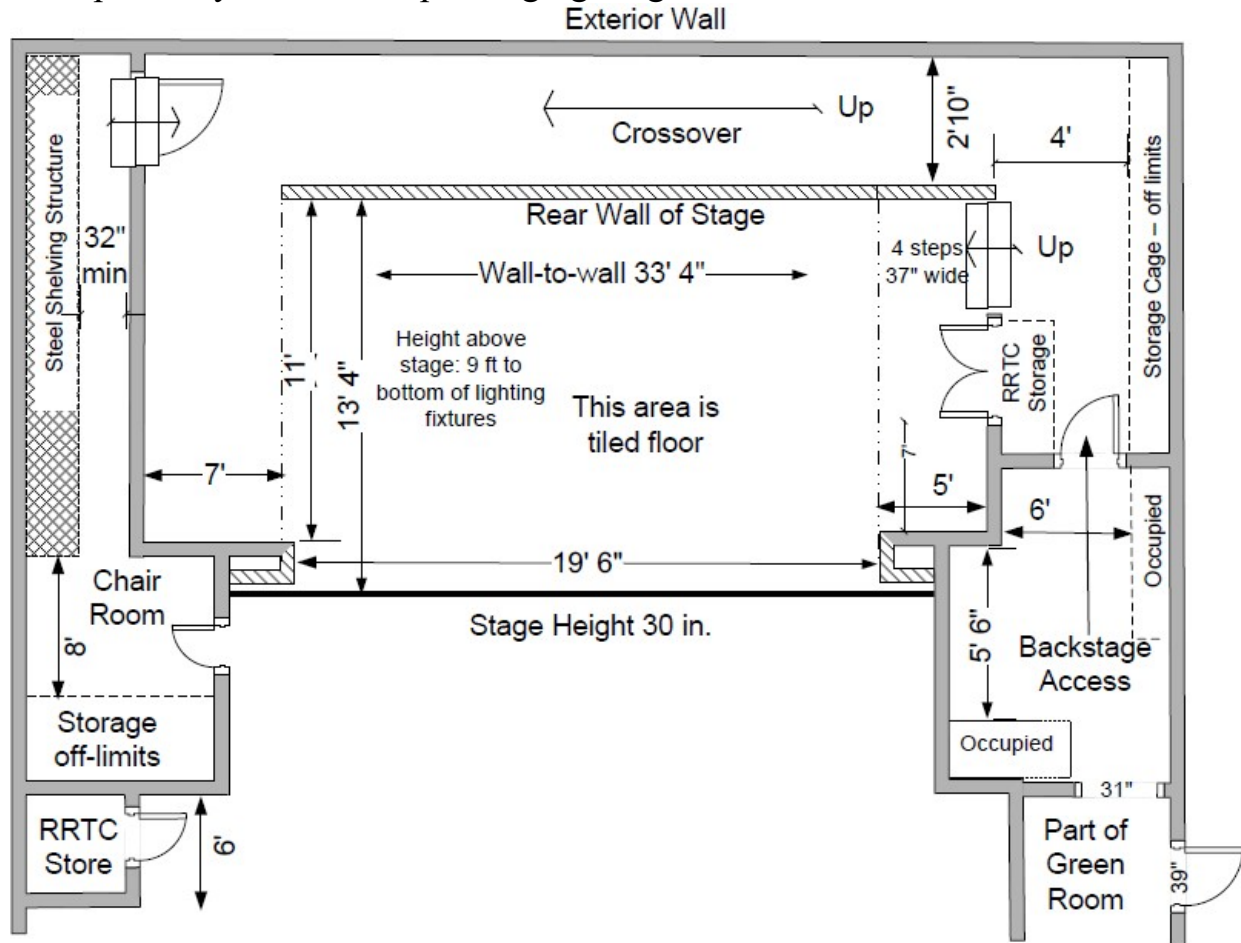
Plan of Stage at Northwind Wireless Fibe Centre
